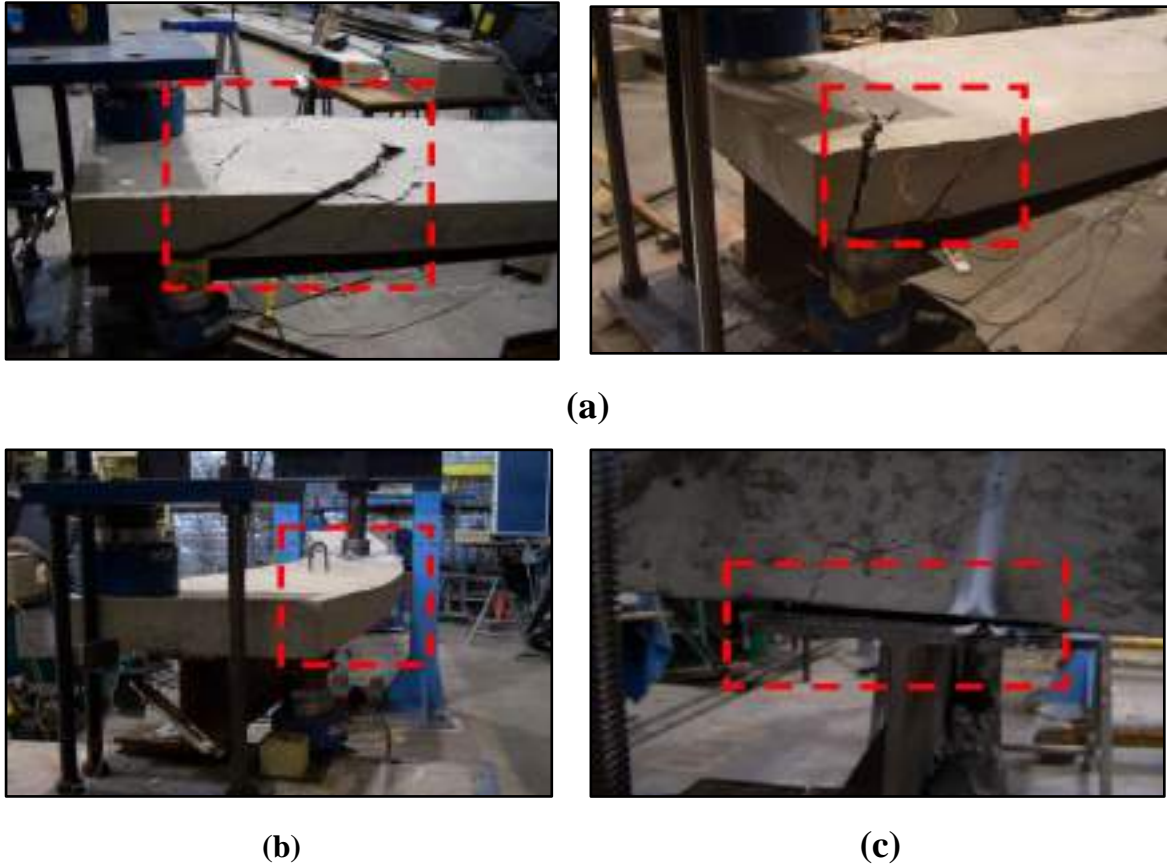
Curved composite beam mode failure: a) diagonal torsional crack, b) Mid span twisting, c) The concrete slab and steel beam separation [21].
